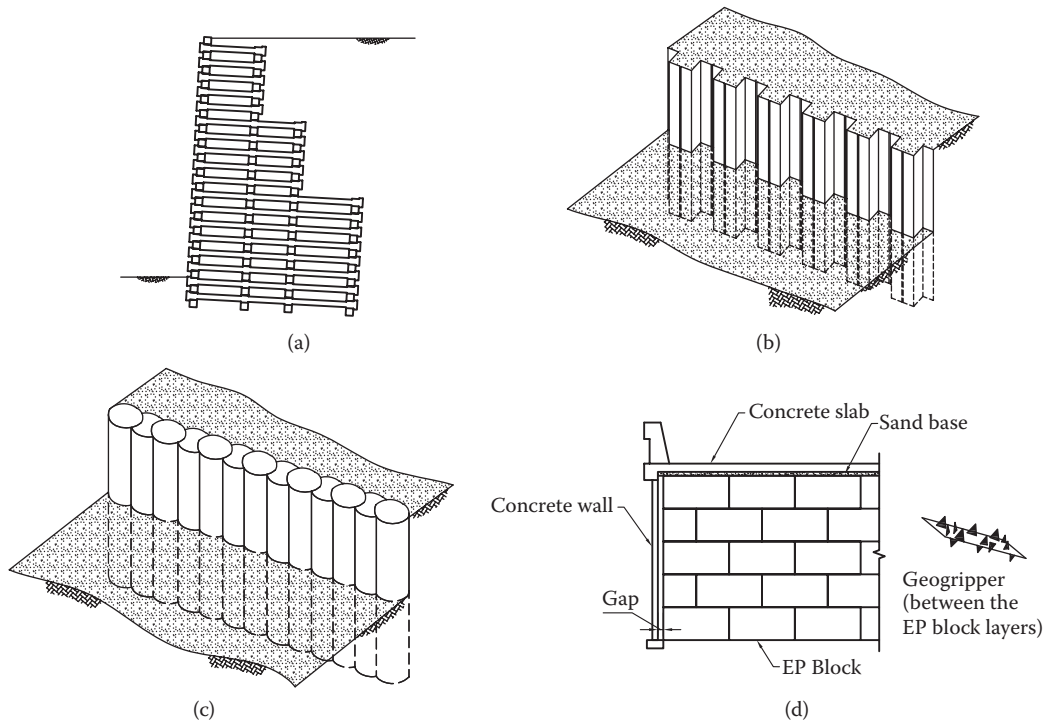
Other types of retaining wall systems. (a) Crib wall typical section, (b) Sheet pile wall, (c) Secant pile wall, (d) ESP fill.
